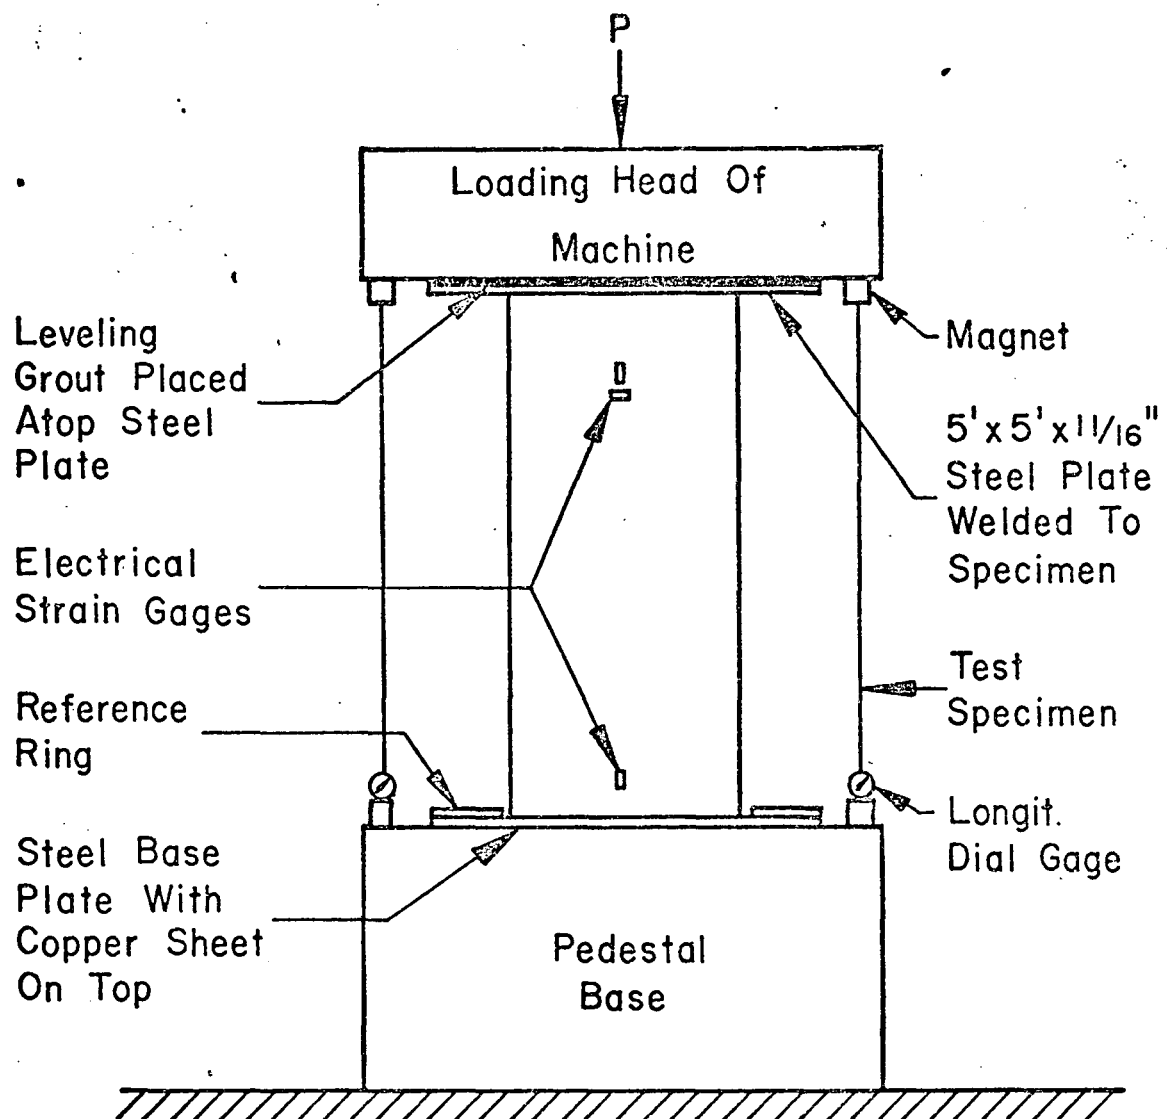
TEST SETUP AND INSTRUMENTATION FOR SPECIMEN P3A
